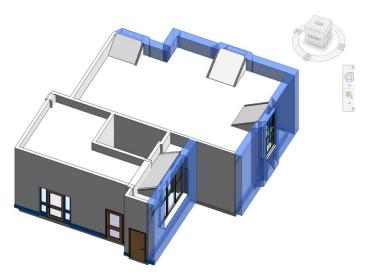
External walls are highlighted. This is deduce because the external wall have windows on it side and are facing outdoor.
